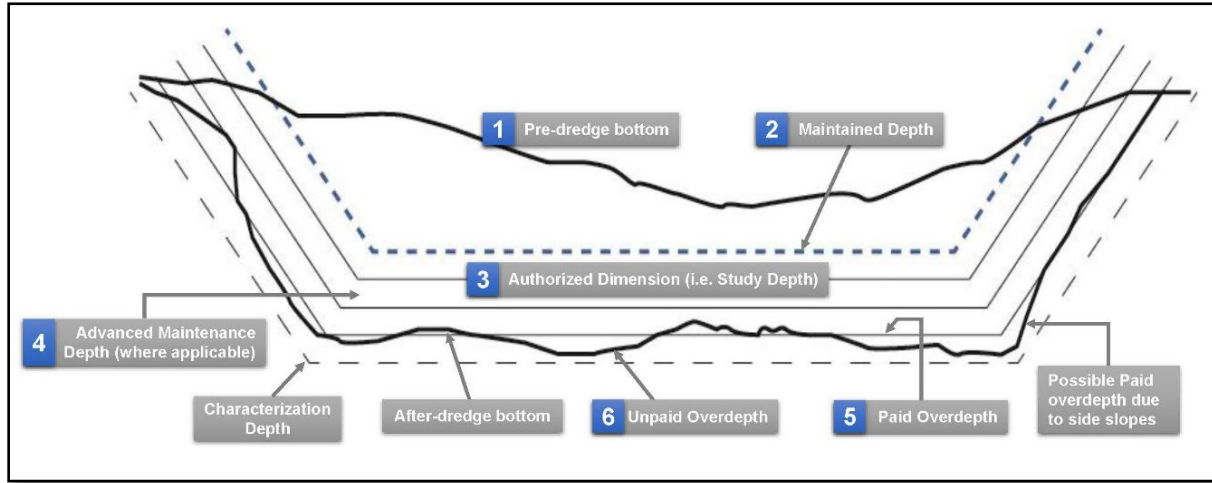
Channel Nomenclature and Typical Channel Cross Section with Dredging Zones
